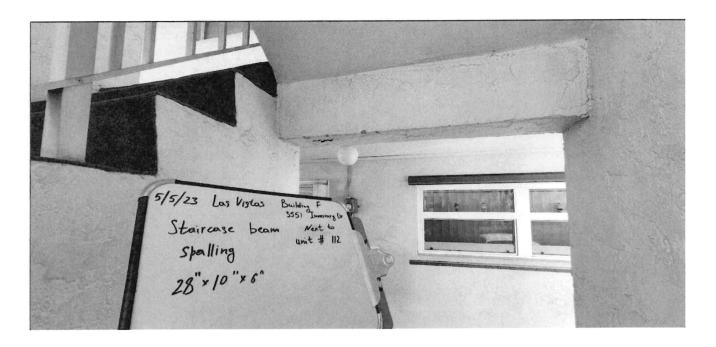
Concrete staircase beam spalling next to unit #112.
